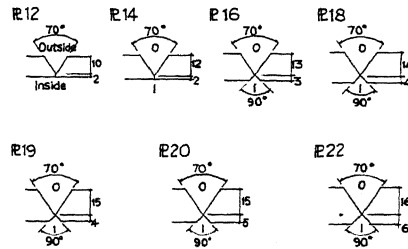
Details of Welded Joint at the Stressed-membrane of the Tower.
